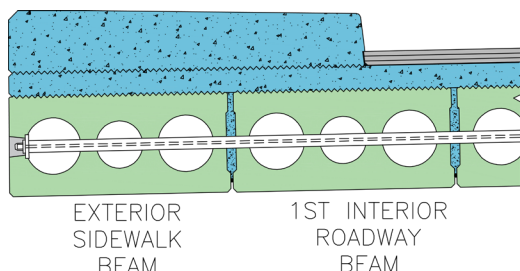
Load Distribution to Adjacent Box/Deck Beams
